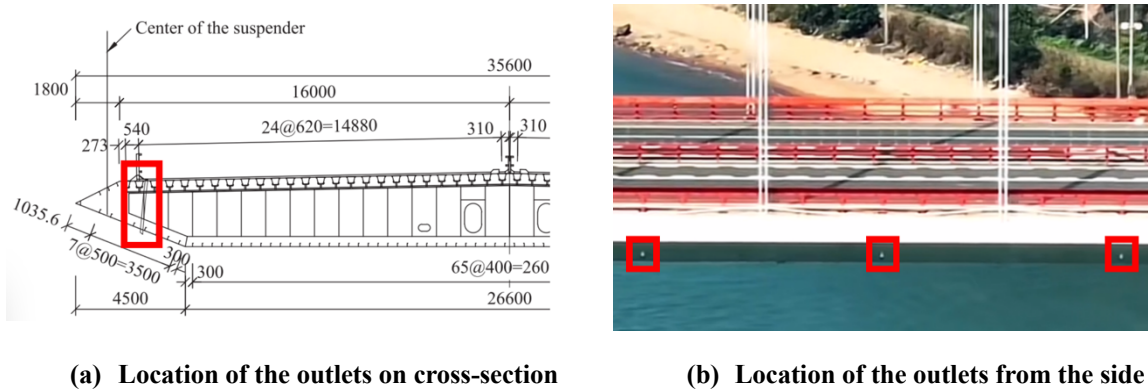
Drainage outlets position on the cross-section of the girder
